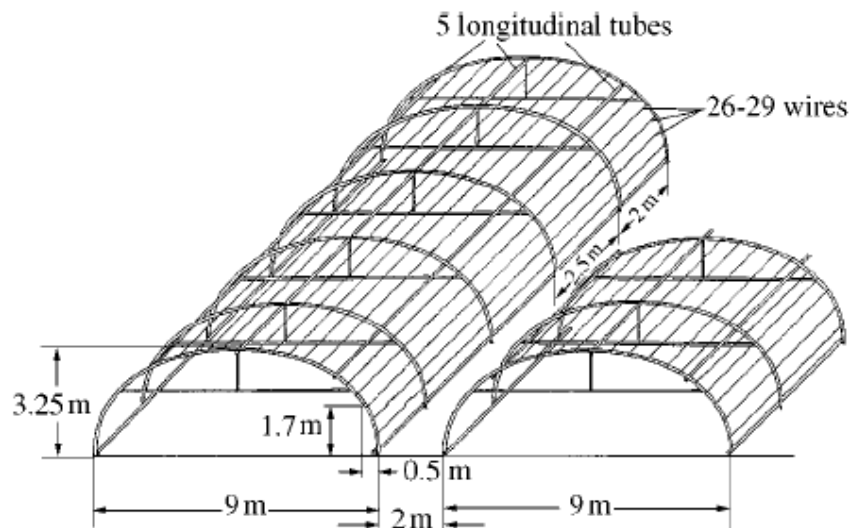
Round-arched tunnel greenhouse with dimensions as an example
